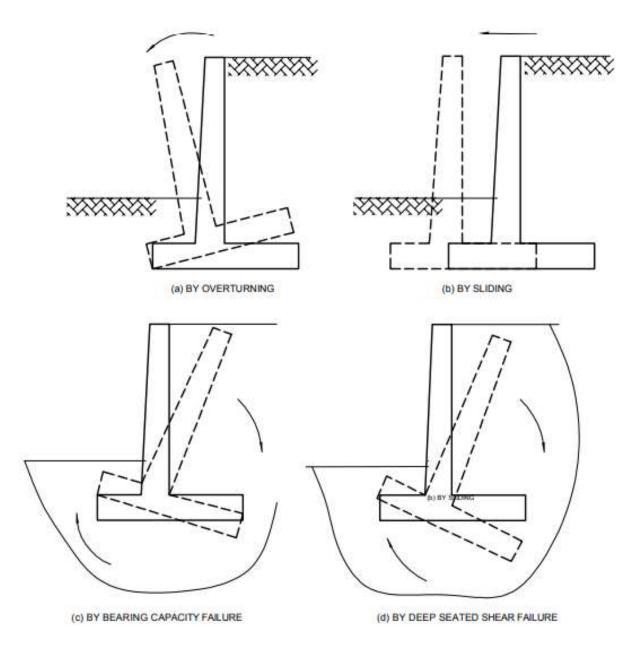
FAILURE OF RETAINING WALL:
